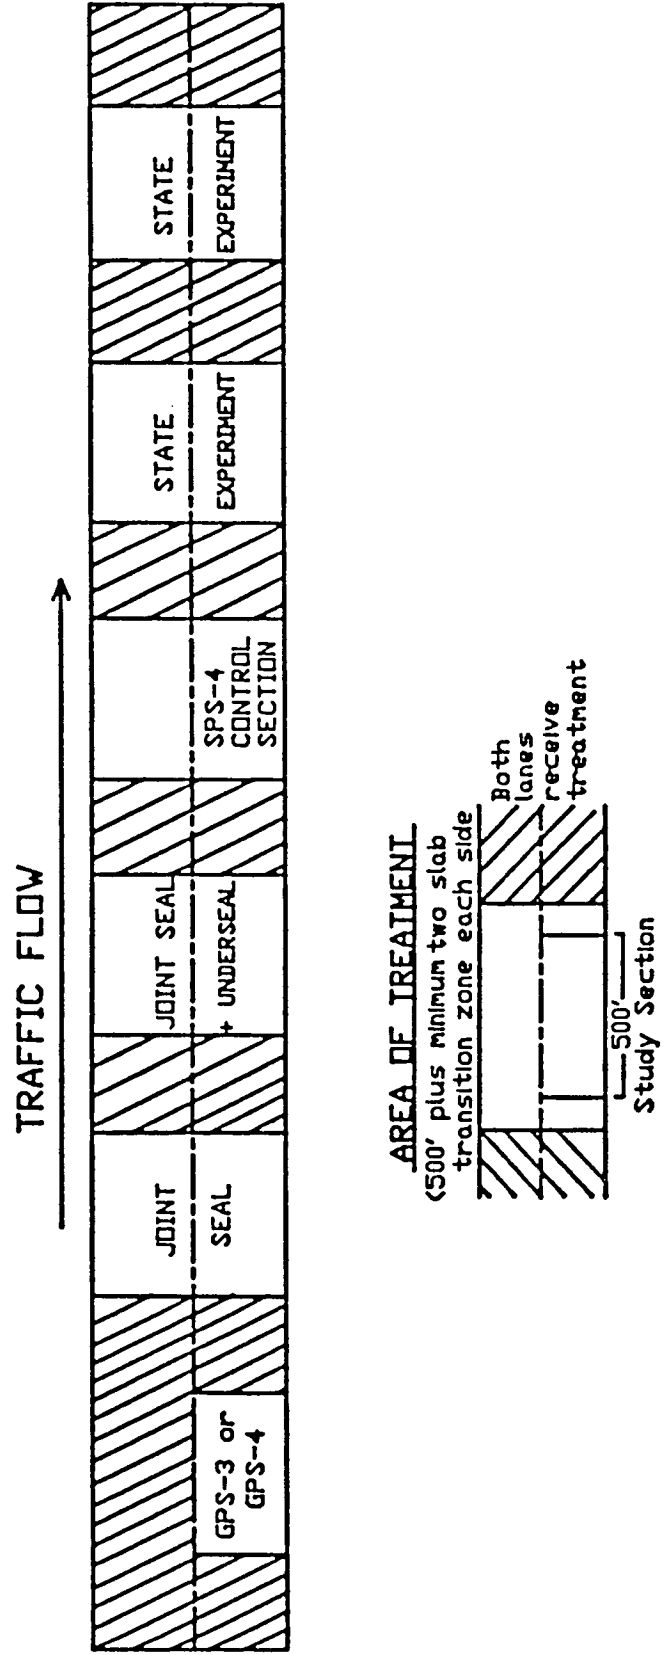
Layout of SPS-4 test sections for rigid pavements.
